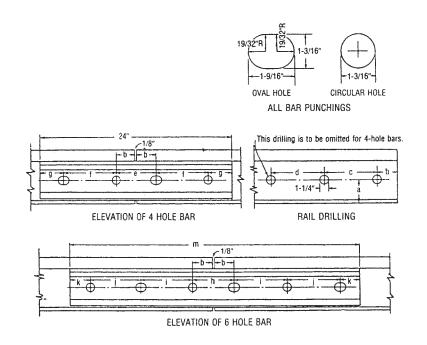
Recommended Rail Drillings and Bar Punchings for 132 RE, 136 RE, 140 RE Rails, and 141 RE Rails and Joint Bars, Utilizing 1-1/8 Inch Track Bolts
